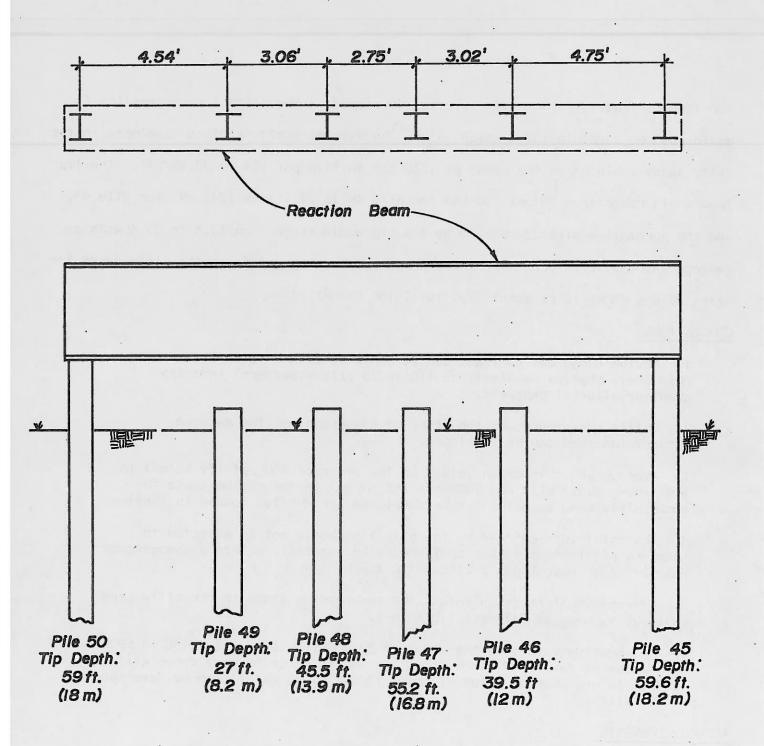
FIGURE I - DIAGRAM OF TEST PILE ARRANGEMENT
